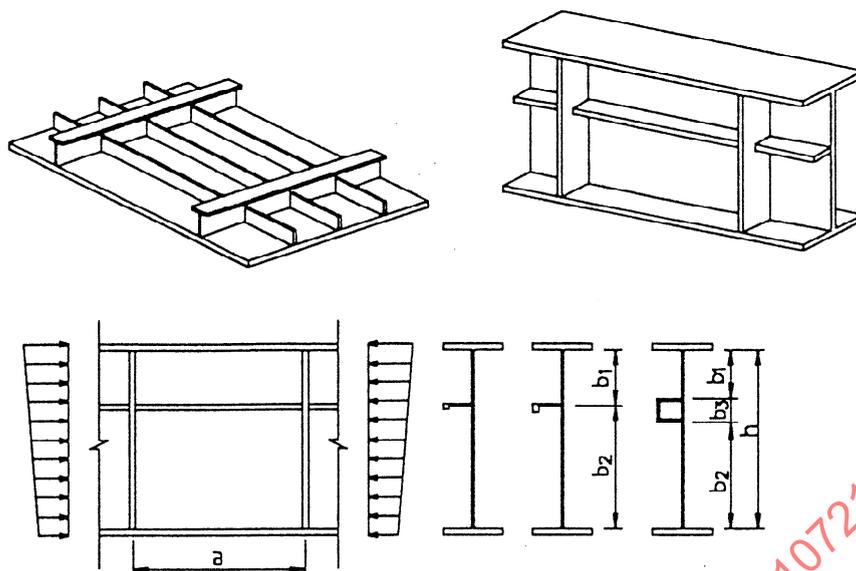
Examples of transverse and longitudinal stiffeners
